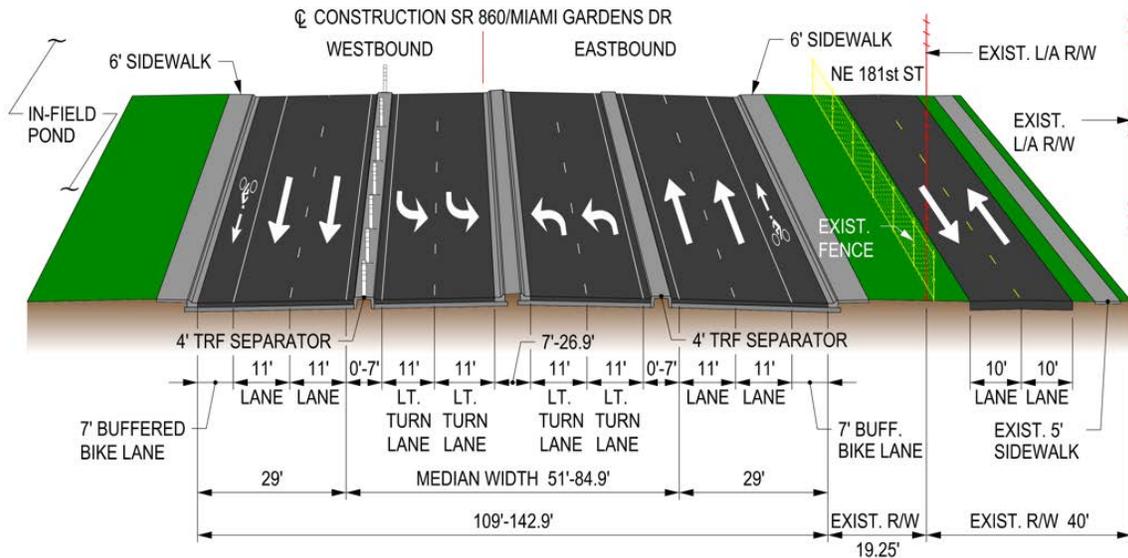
3: Proposed Typical Section - Alternative 1 – SR 860/Miami Gardens Drive
